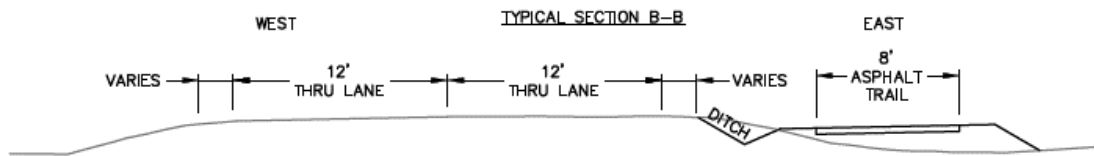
Typical Section B-B for CSAH 33 Concept 2
